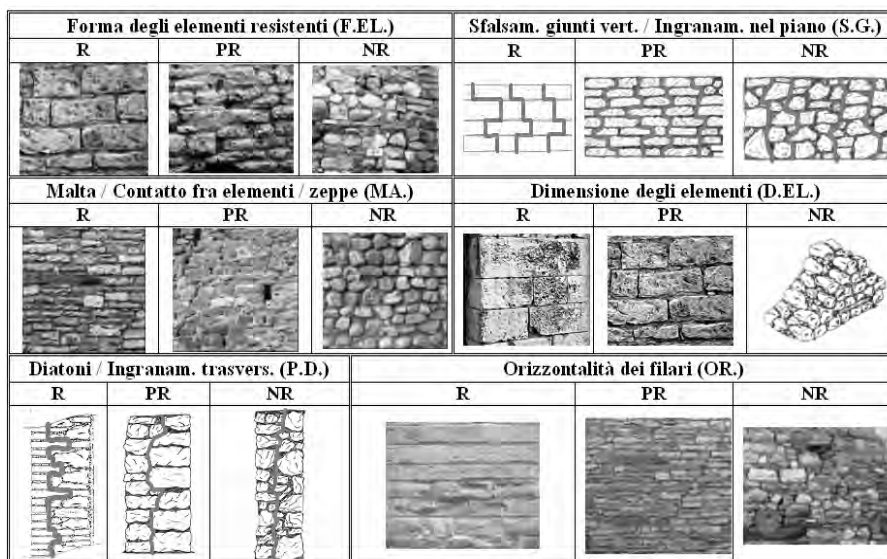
Masonry Quality Index (IQM): visual inspection of masonry texture and cross section.
